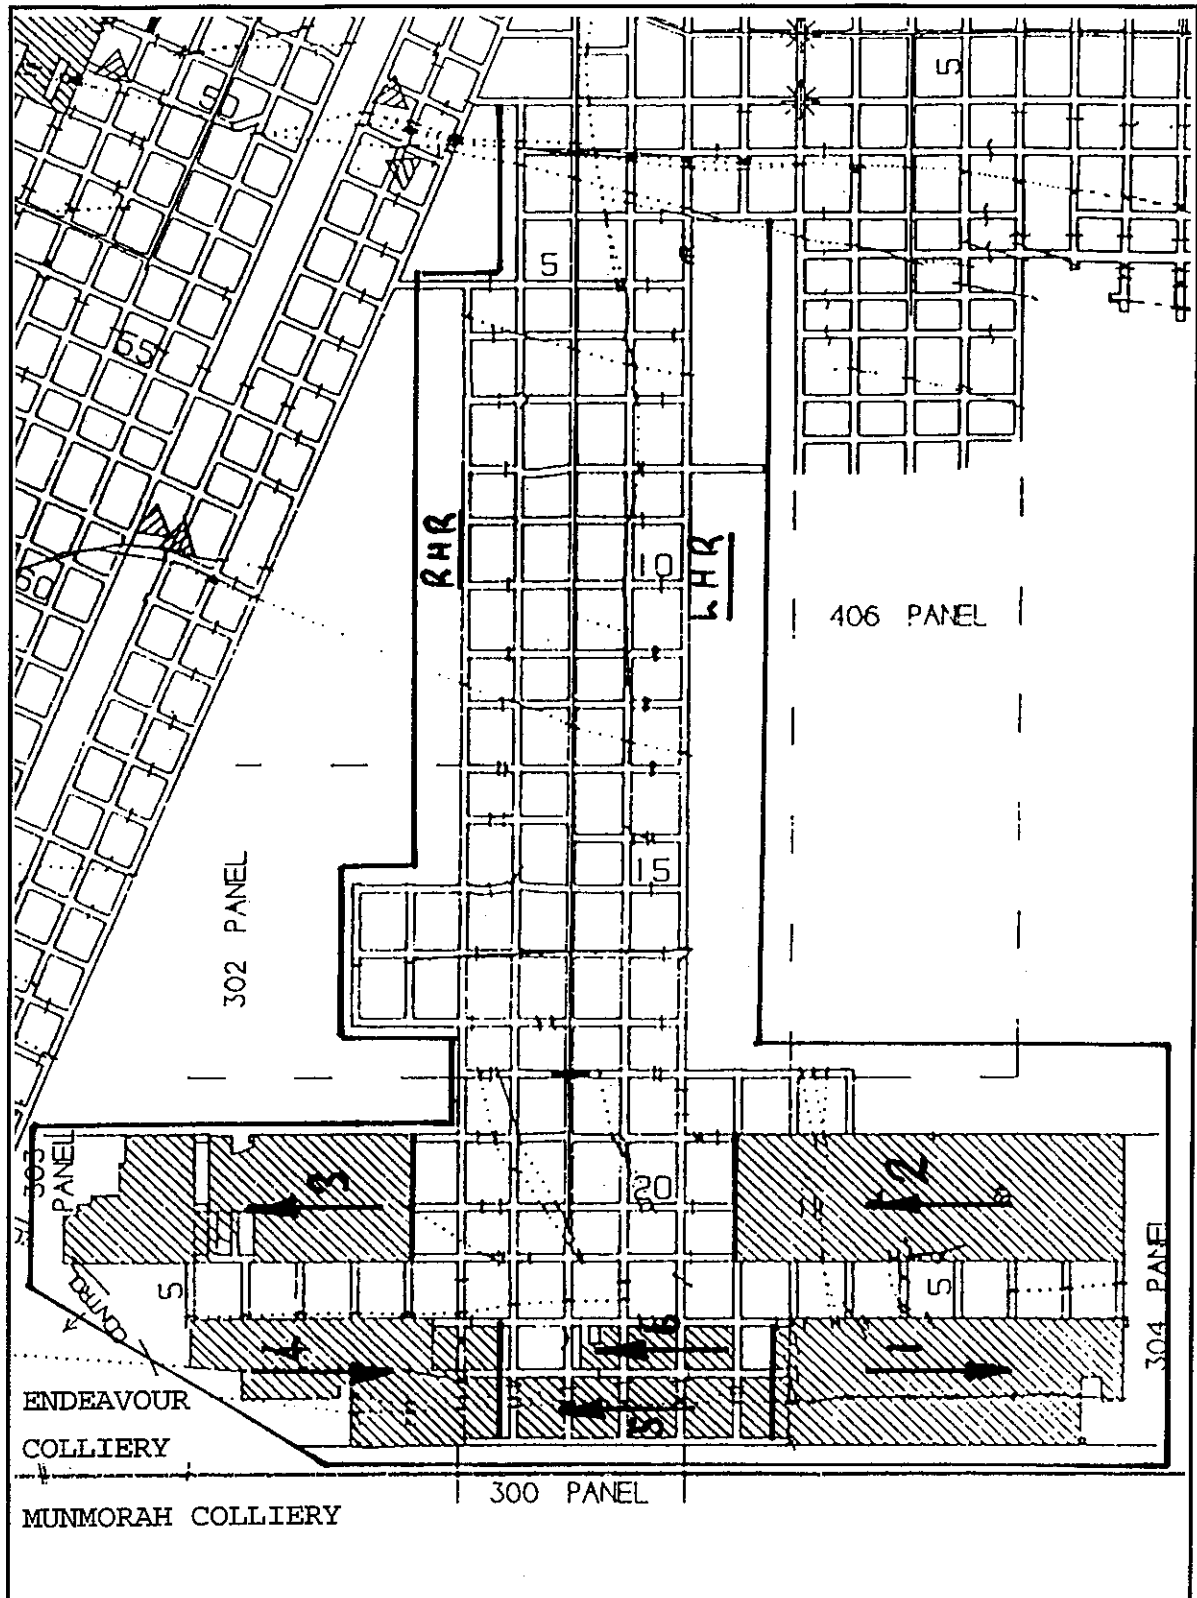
Location plan, significant wind blast and explosion, Endeavour (Newvale No. 2) Colliery
